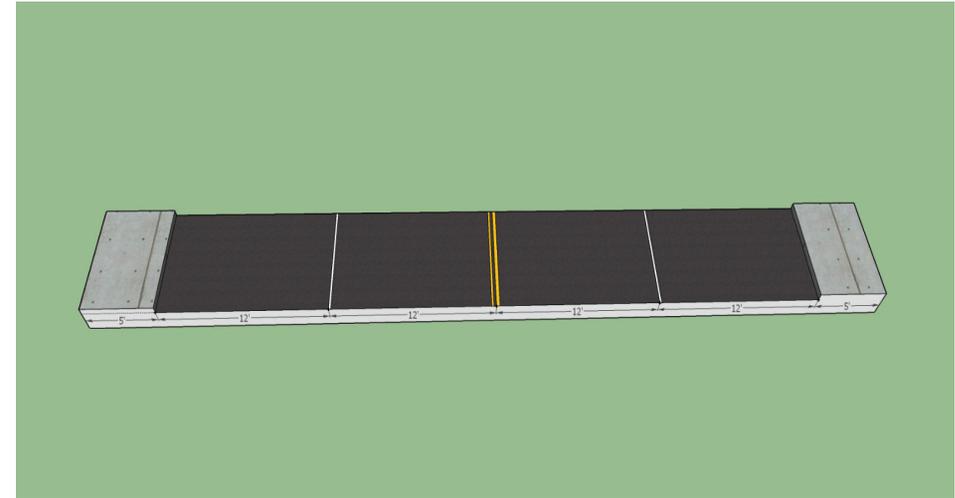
Proposed redesign for Bill Kennedy Way bridge over I-20
